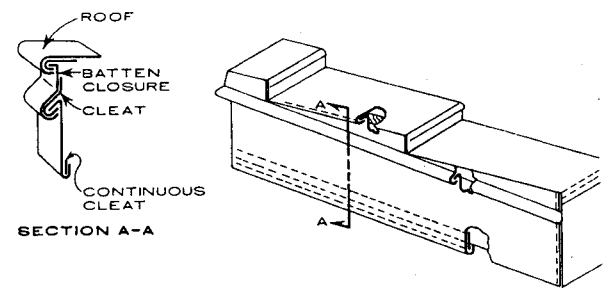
CONSTRUCTION AT CLOSURE AND VALLEY
